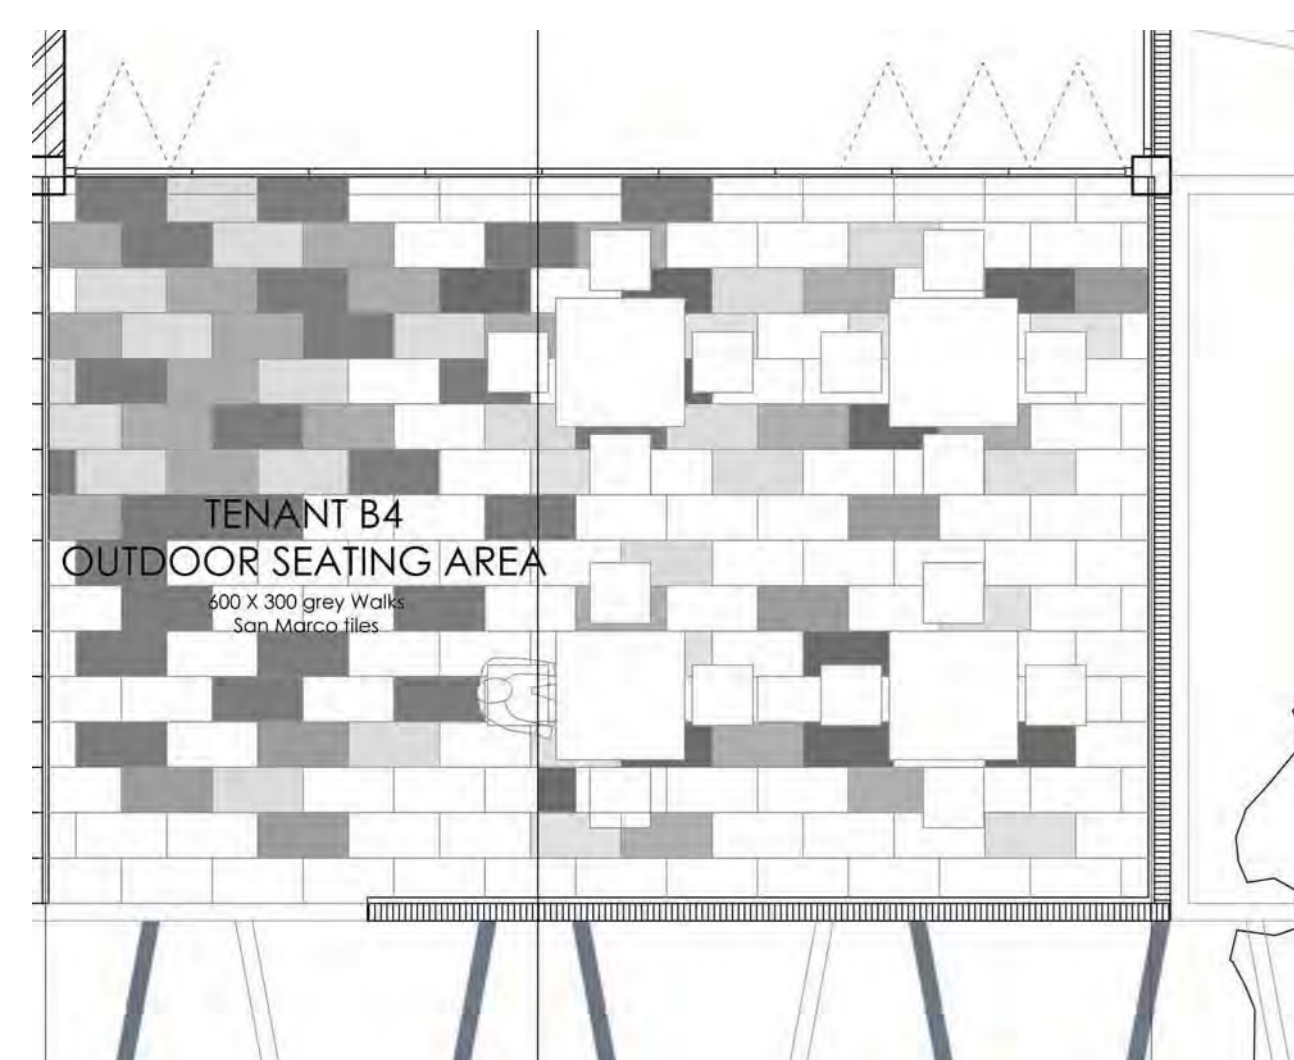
Outdoor Seating Area Plan Scale 1:50
